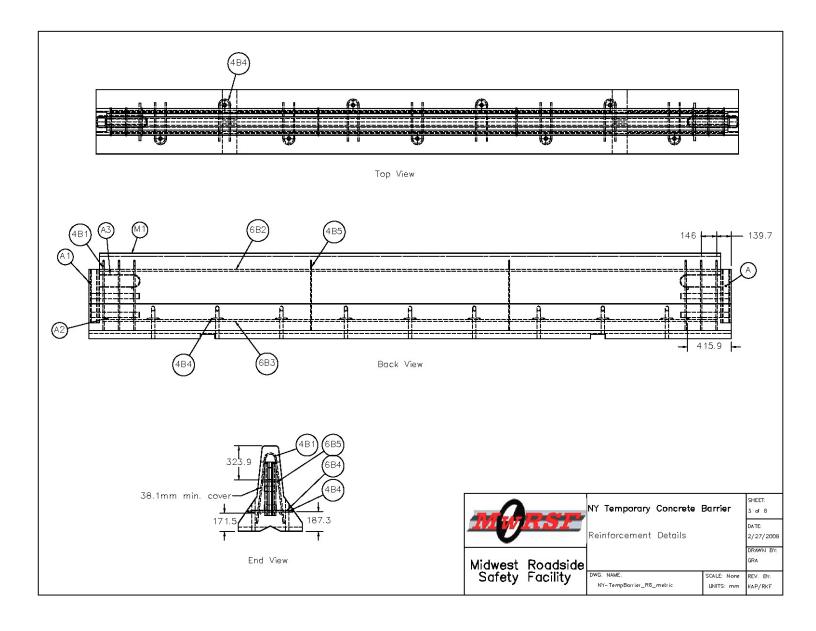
Temporary Concrete Barrier Reinforcement Details, Test NYTCB-2
